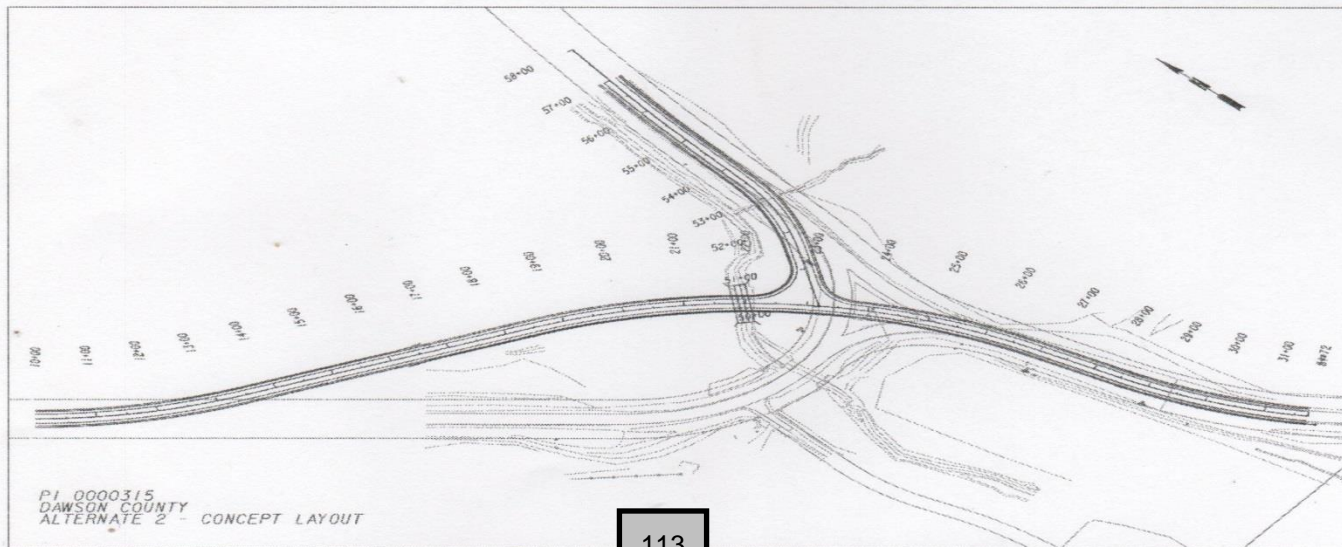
Alternate 2, T-Intersection to North of Existing Y-Intersection
